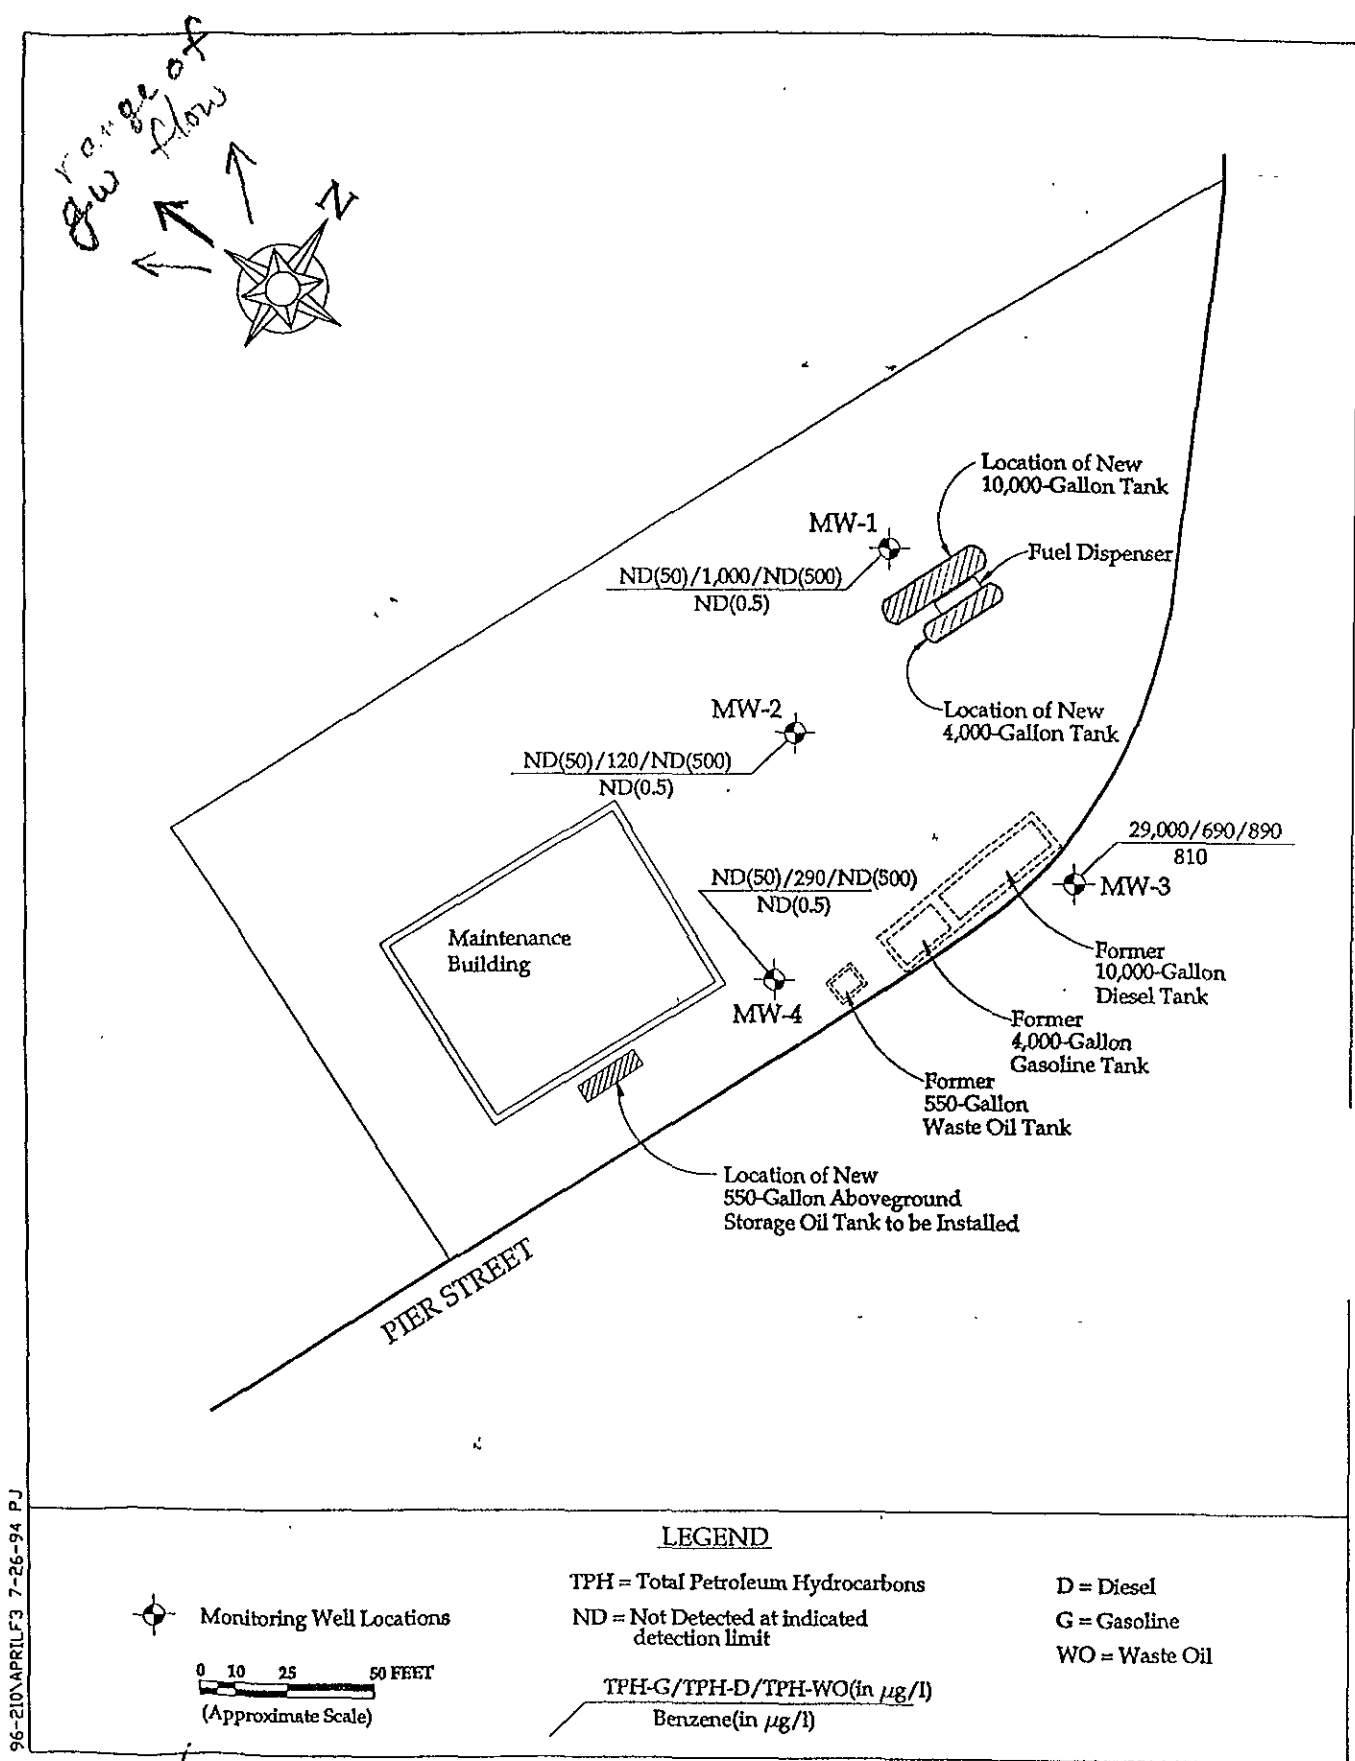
Site Plan with Extent of Excavation and Sample Locations
